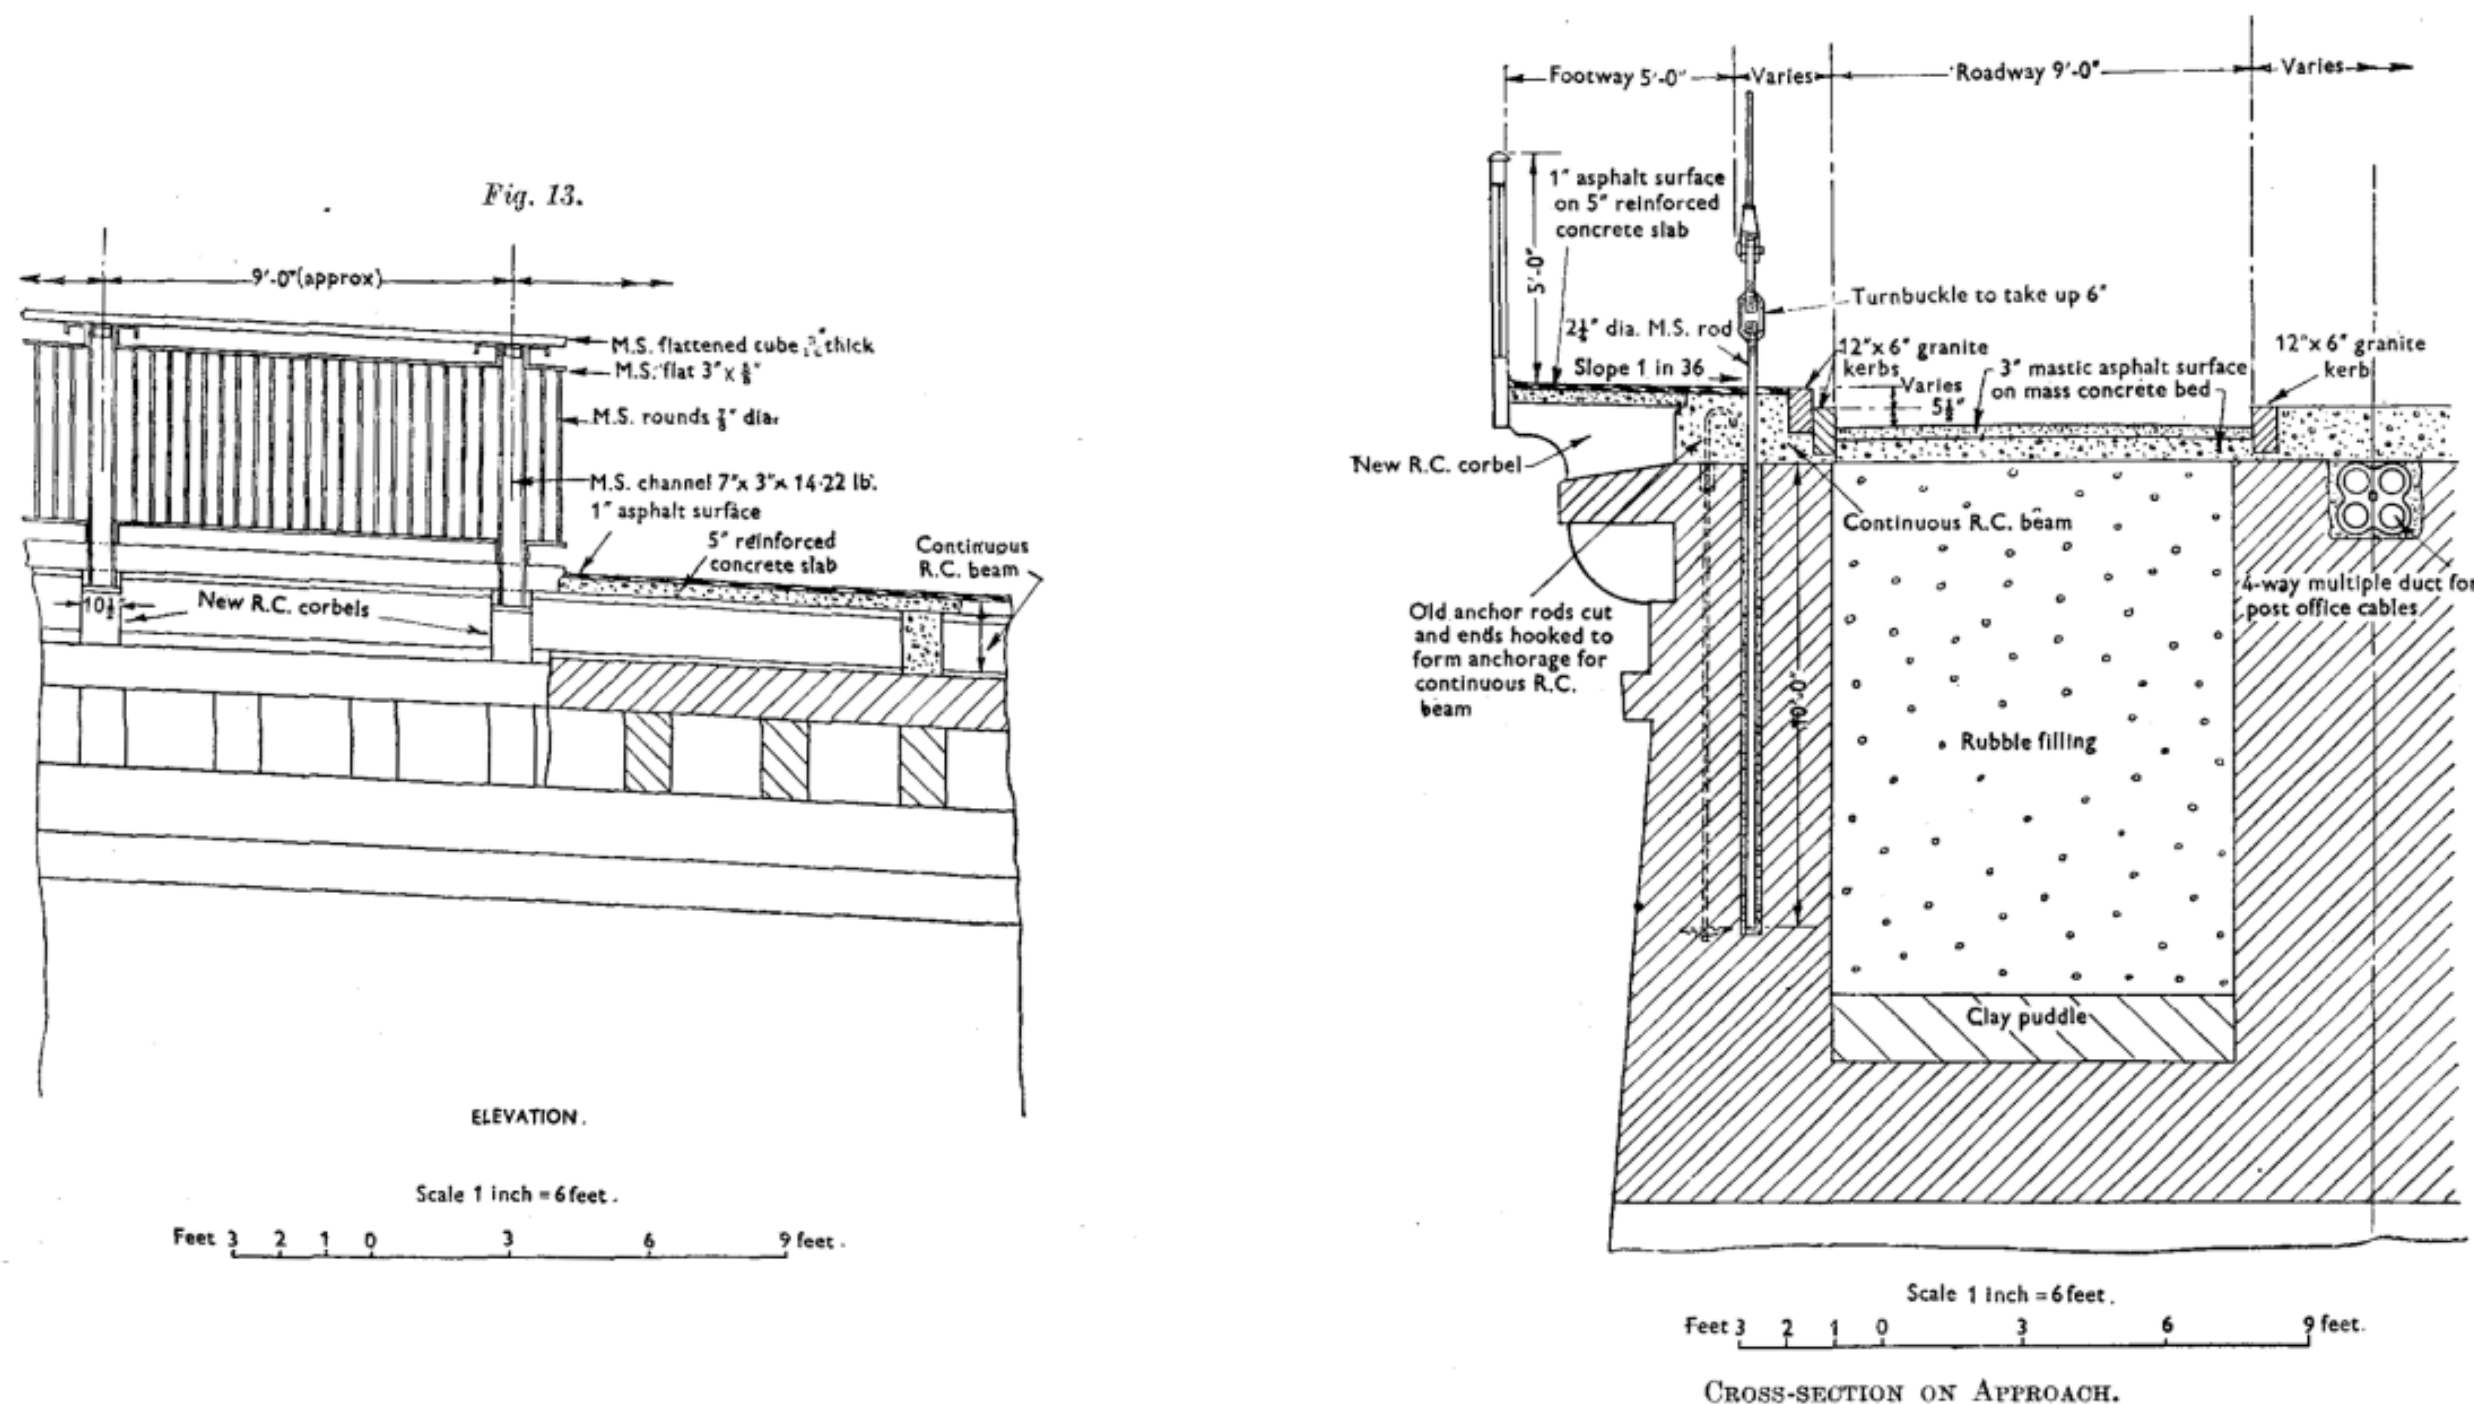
Extract from reconstruction drawings of 1938-1940 showing side elevation and cross-sectional view of footway and parapet details
